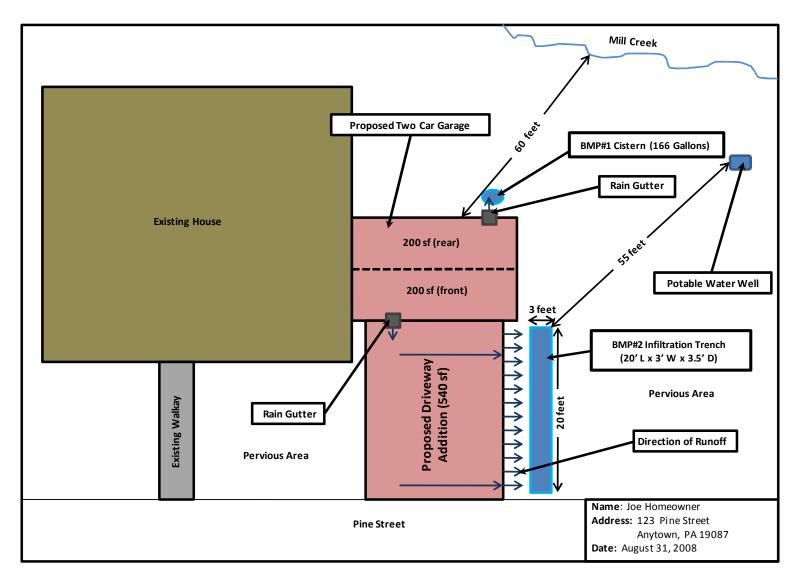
Example of Simplified Stormwater Management Site Plan for Joe Homeowner
